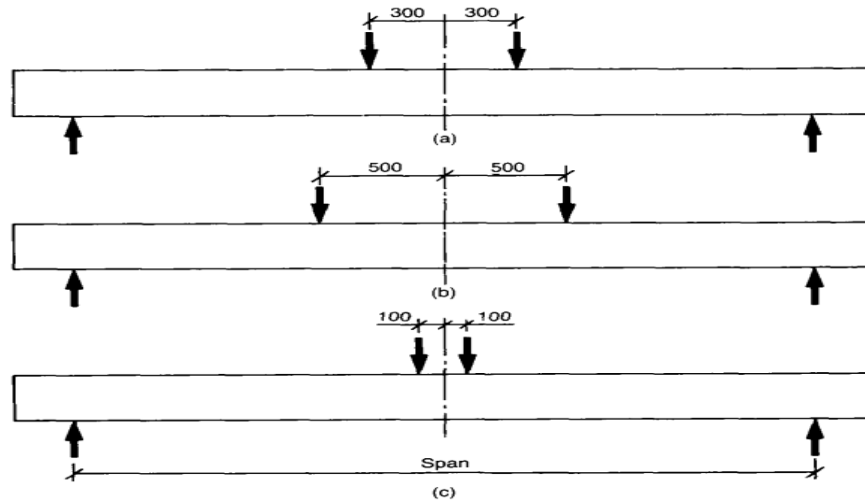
Alternative loading arrangements(Cairns & Zhao, 1994)
